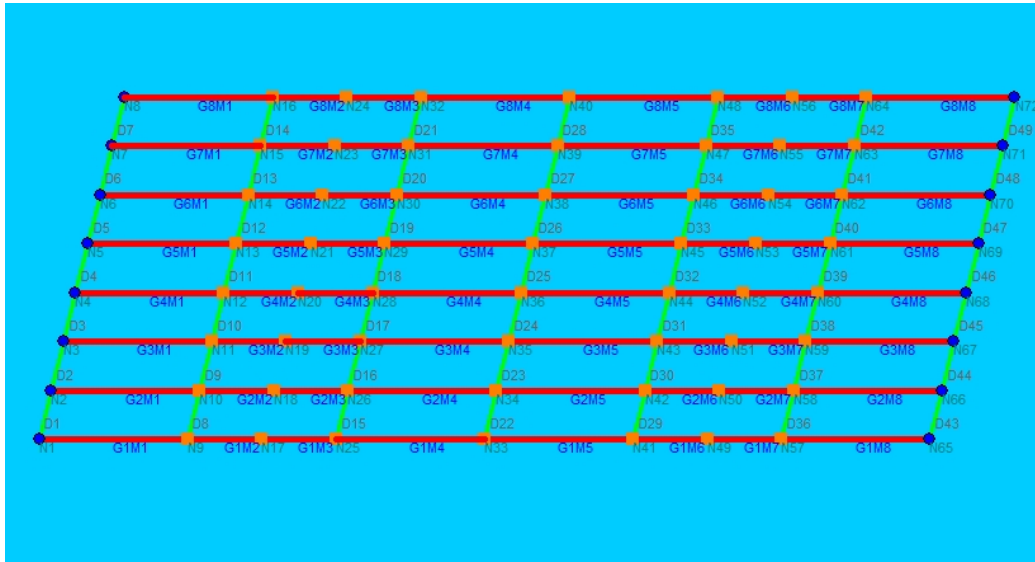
I-270 over Middlebrook Road Bridge Model in MERLIN-DASH
